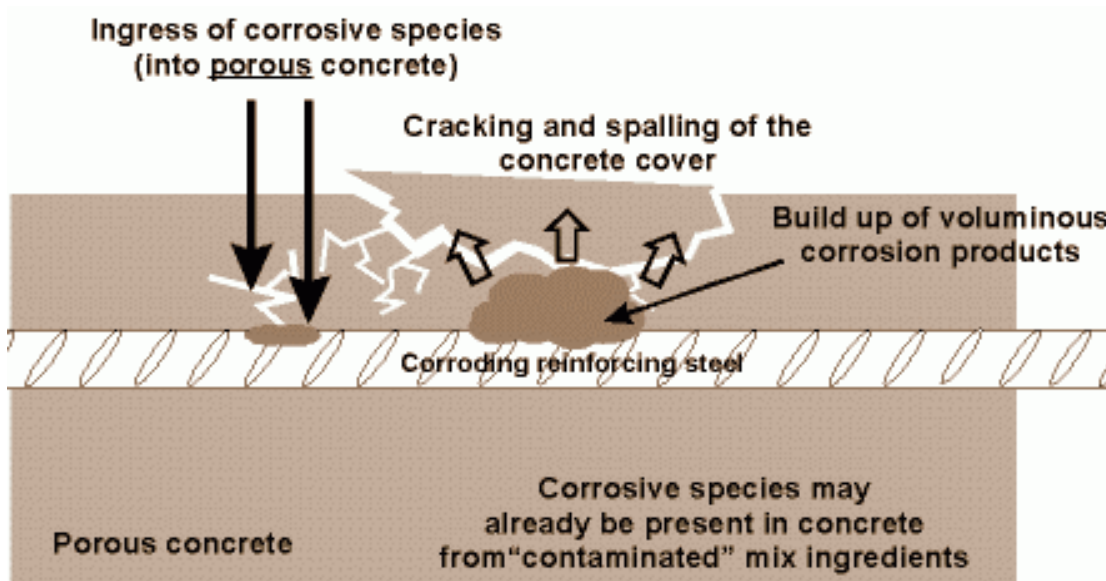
Schematic diagram of cracking and spalling in concrete.
